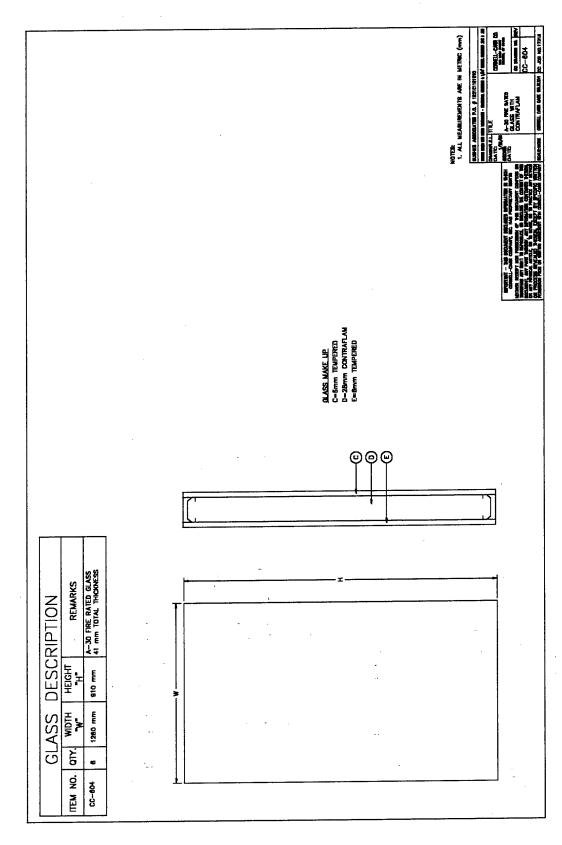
Drawing of the glazing reproduced with permission of Cornell-Carr Company.
